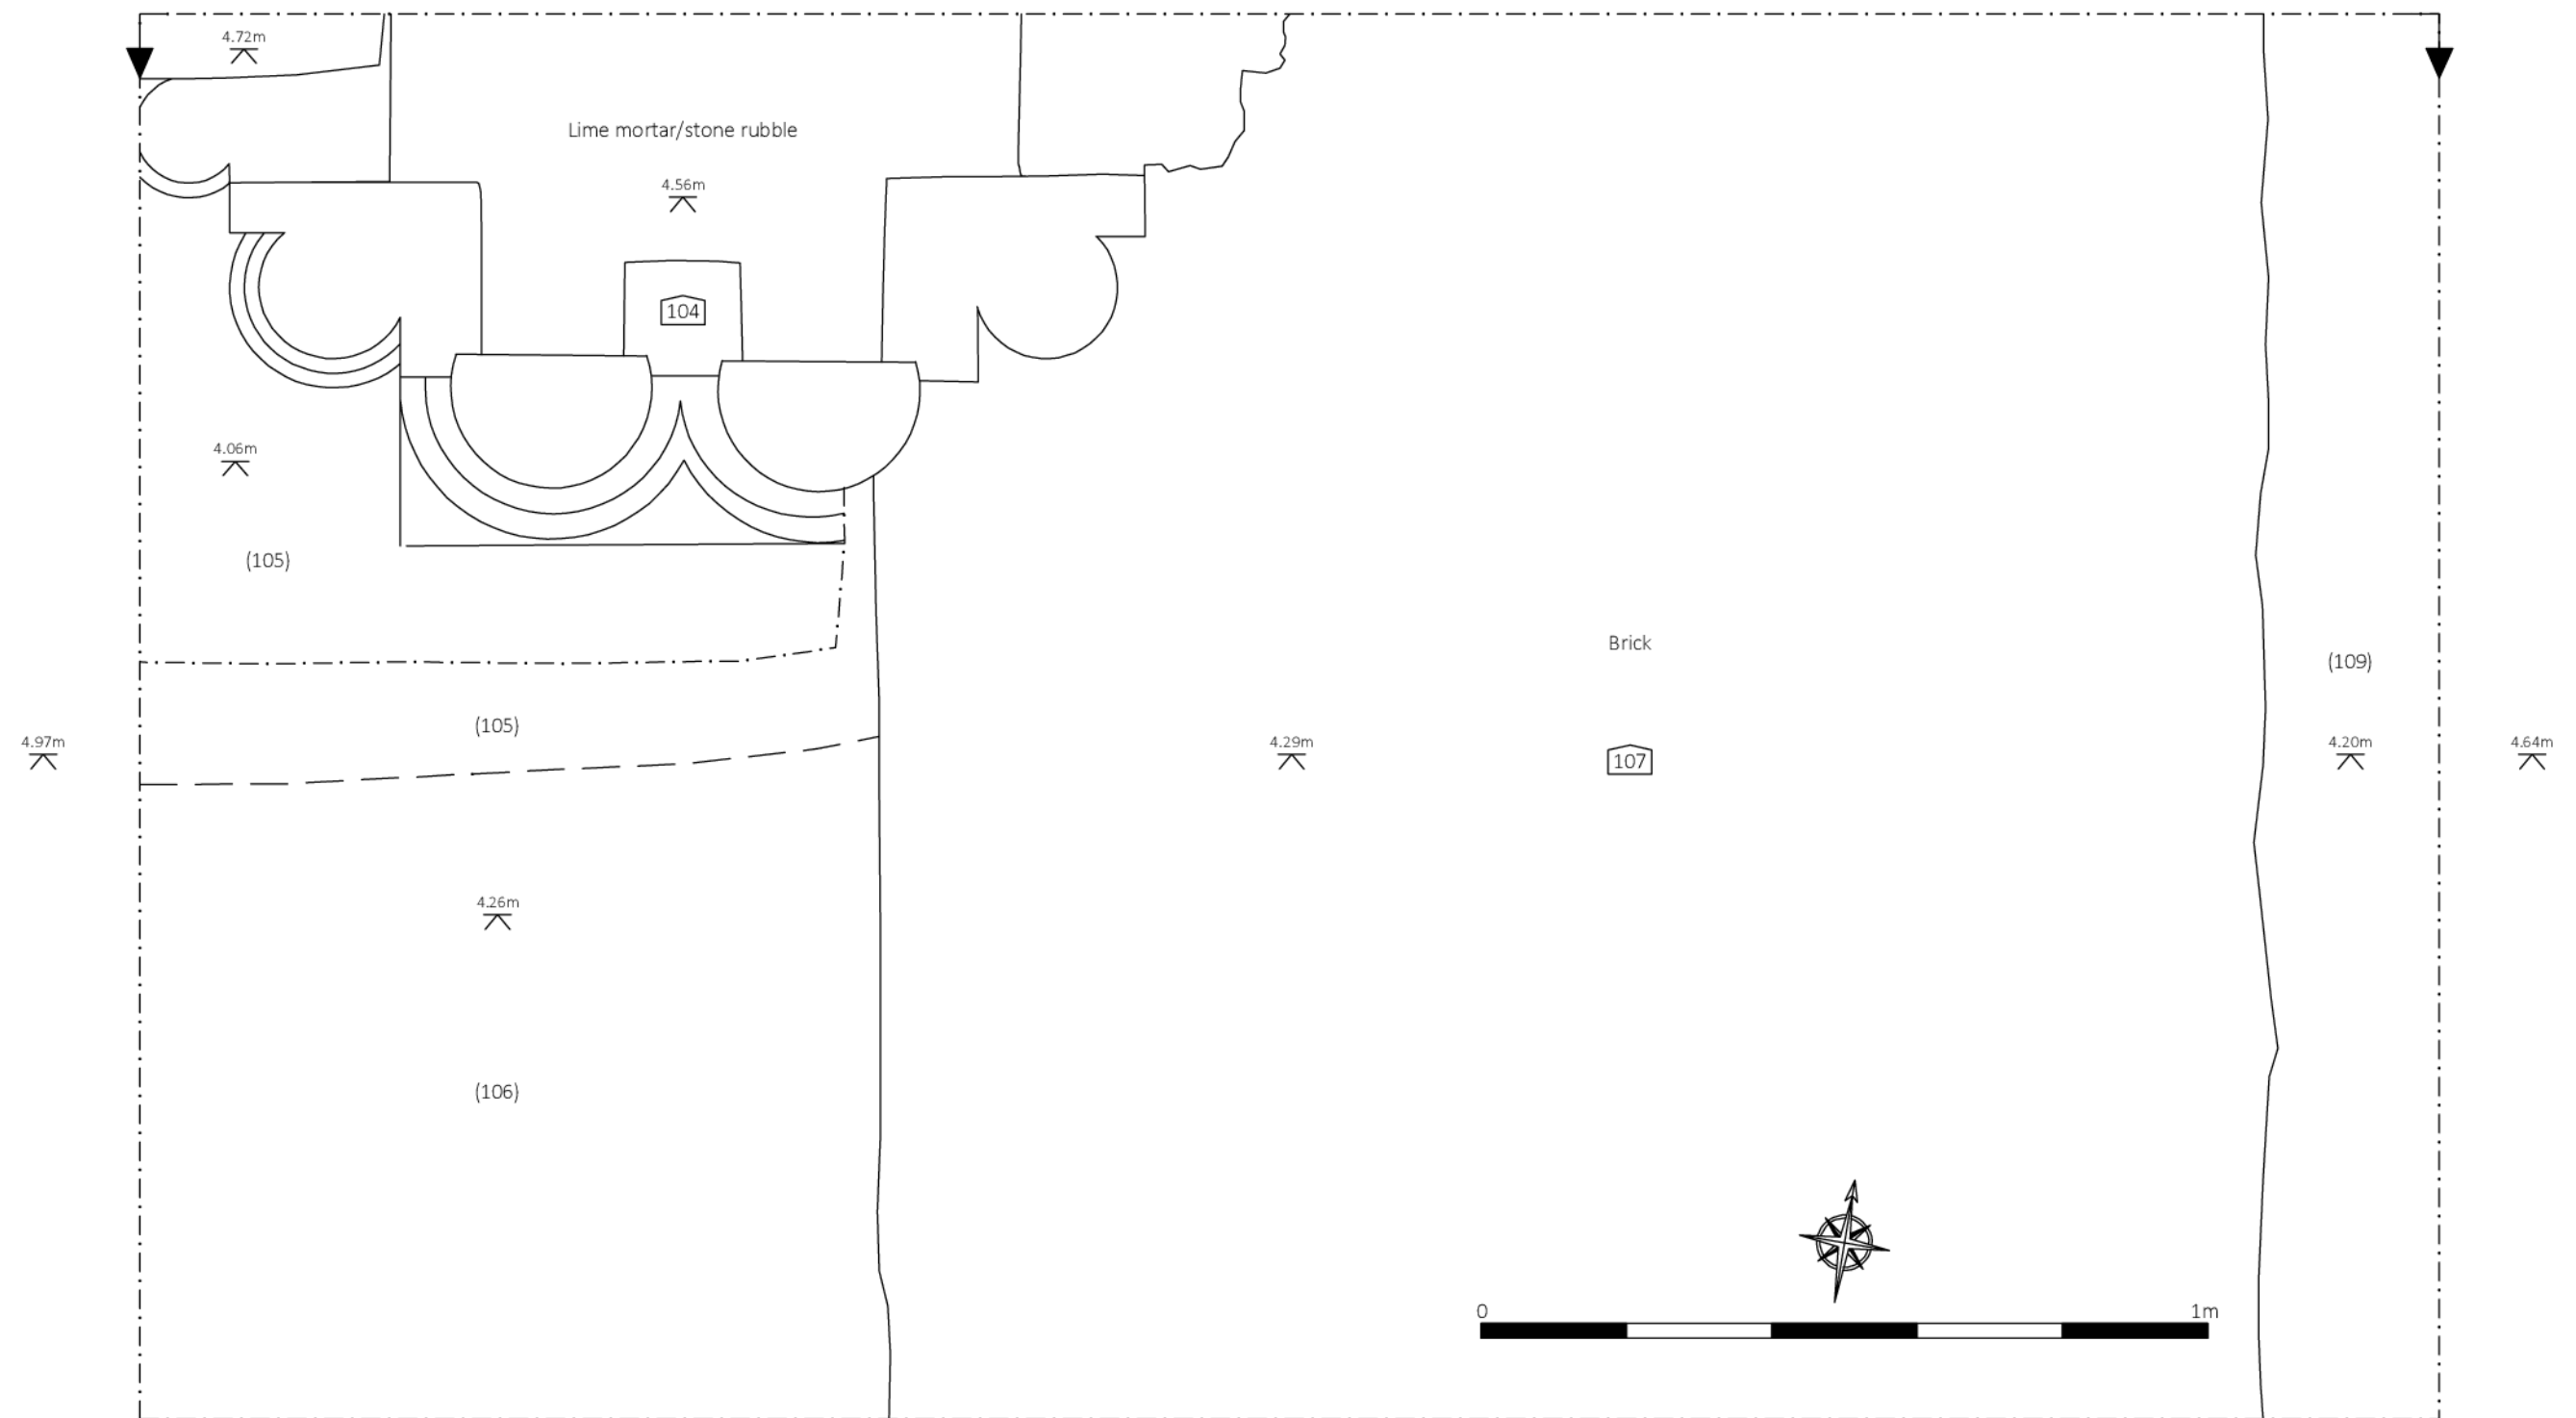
Plan of wheelchair lift excavation, including original pier base [104], (scale 1:10)
